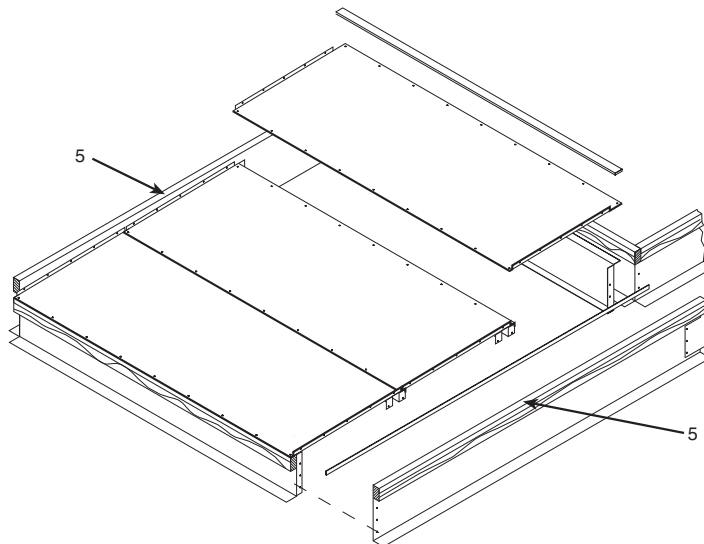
Gasket Location — Condenser Section Roof Curb (Size 070-100 Units)
